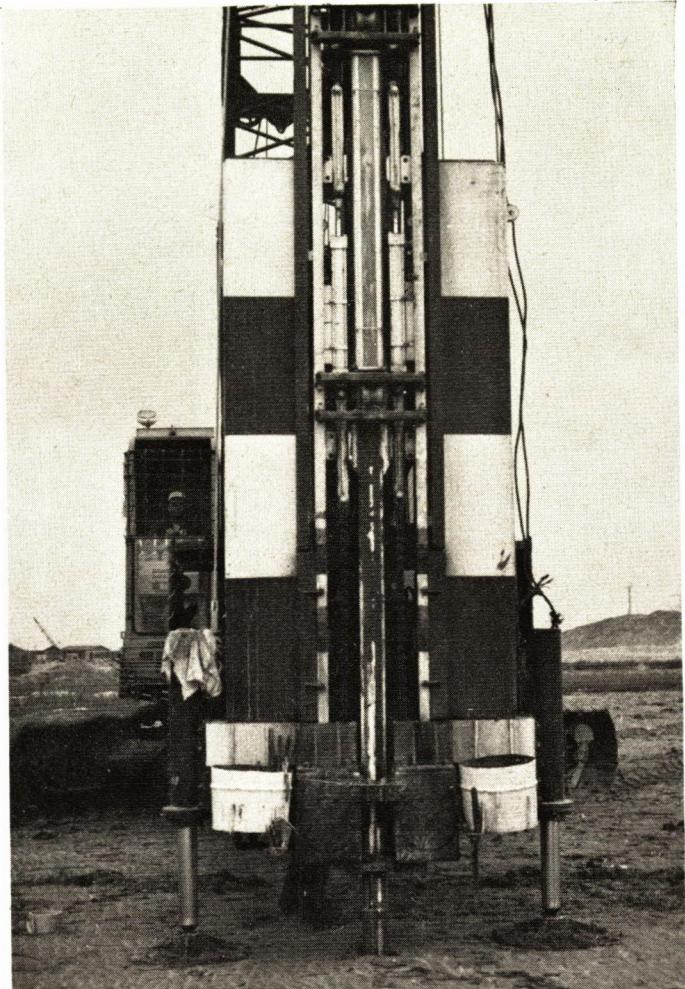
Installation of Castle Board drain by a static force. In this case, the drain is placed outside the mandrel
